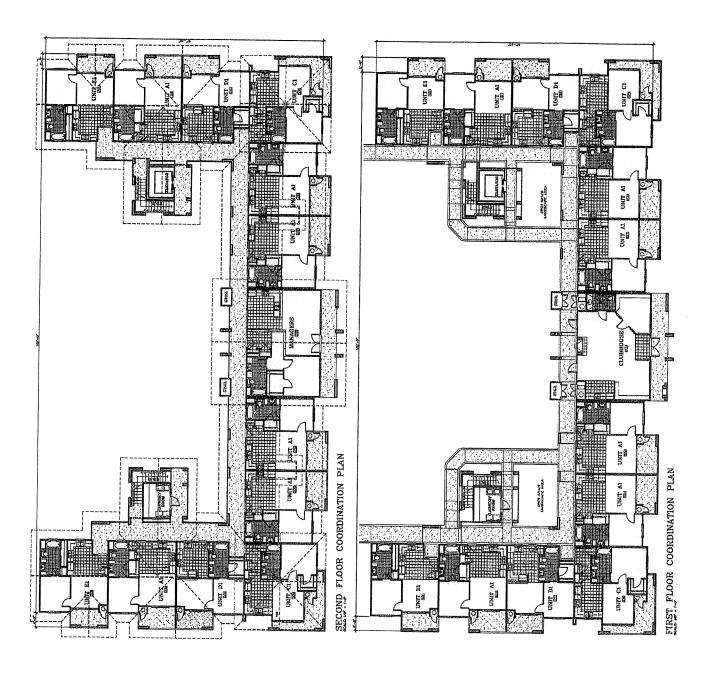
Las Palmas II sub-site First and Second Floor Plans
